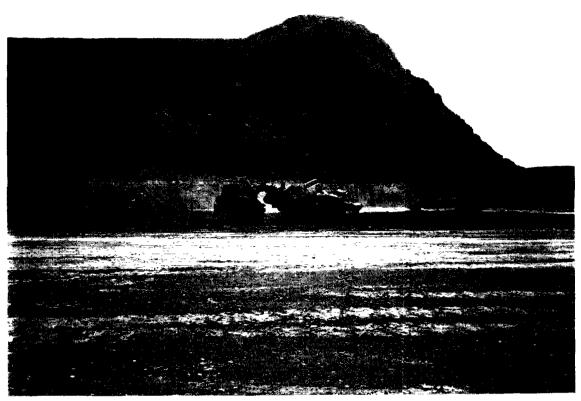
Scrapers hauling backfill material to Jackpile pit. (JP-OP-41)
